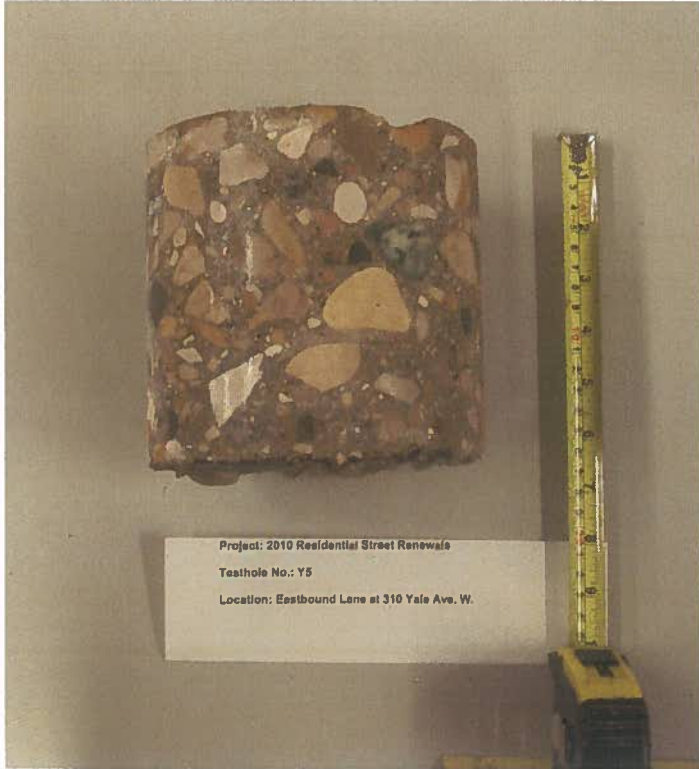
Test Hole Y5: 311 Yale Ave. W., Eastbound Lane, 65 m W of W sidewalk at Winona St., 1.9m N of S curb
